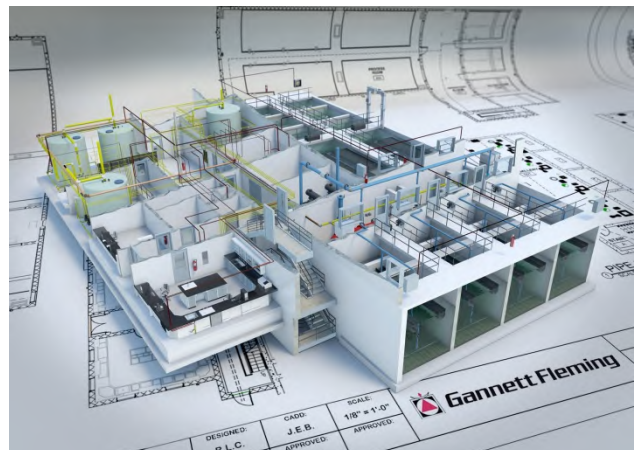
Gannett Fleming used Revit Building Information Model (BIM) software to design the Cabin Creek WTP, which enabled project stakeholders to see the facility constructed through a 3-D computer model during the design phase, before construction began.
